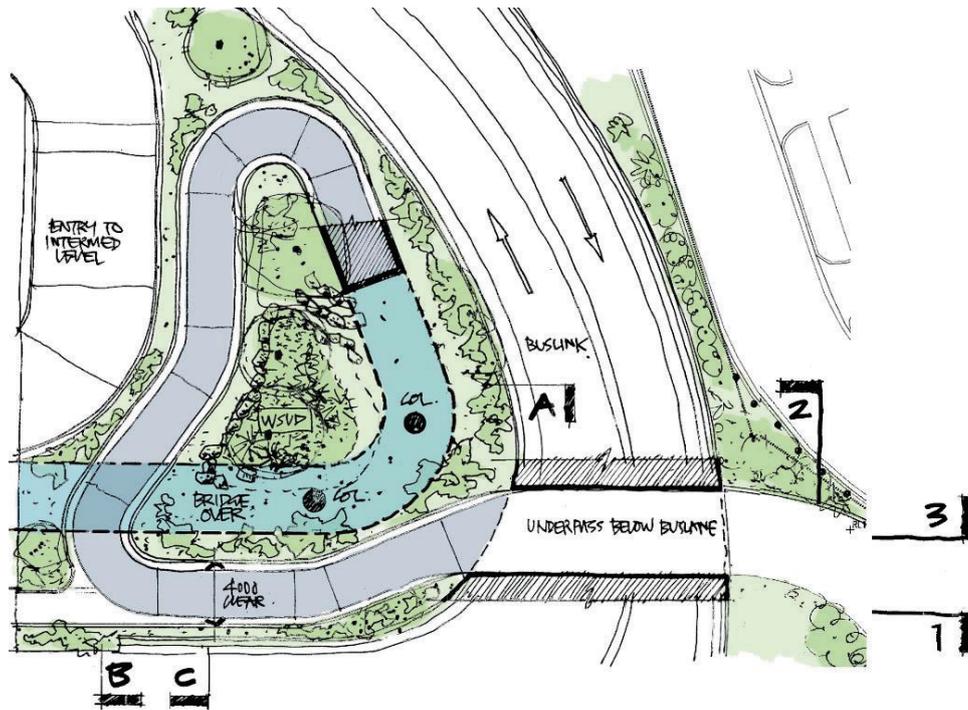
Shared use path detail at the east of the building (from UDLP drawing 26)
